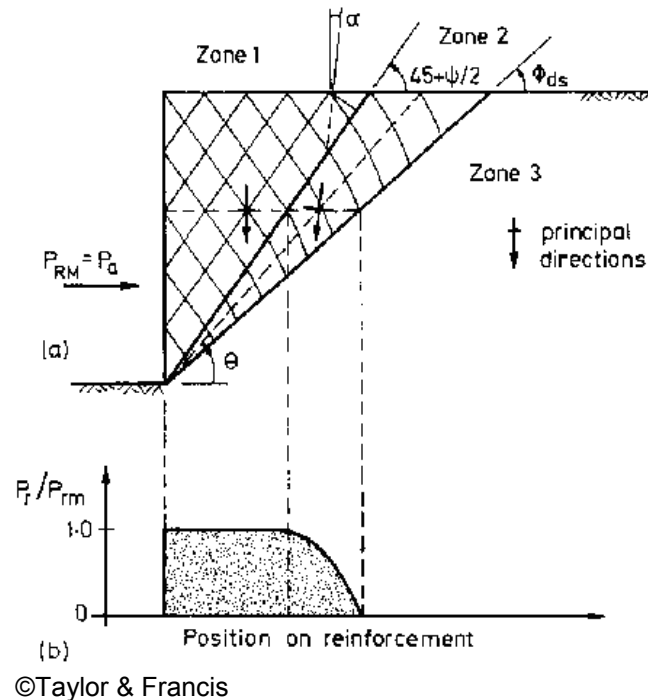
Illustration. Major zones of reinforcement forces in a GRS wall and the force distribution along reinforcement with ideal length.⁽¹⁹⁾
